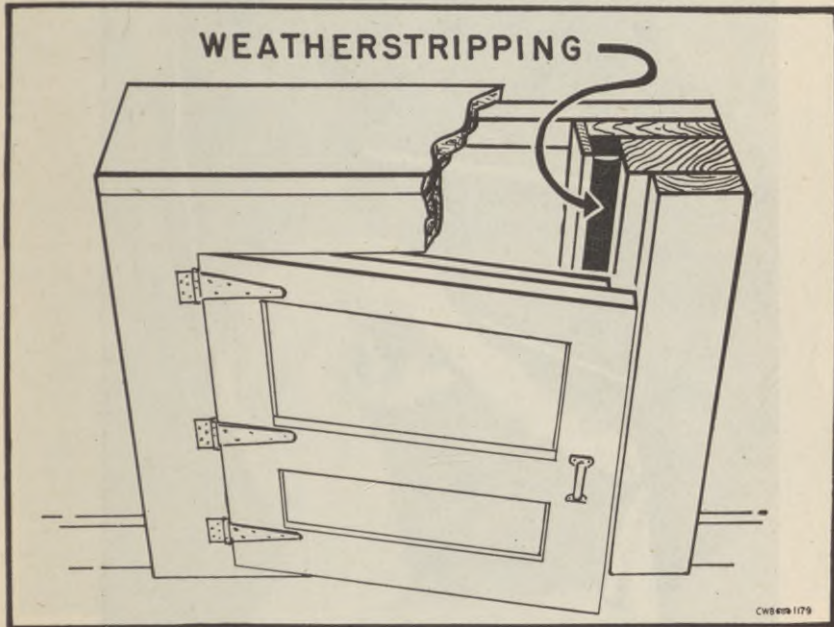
Construction of wooden door used in air lock, showing method of gasproofing.
